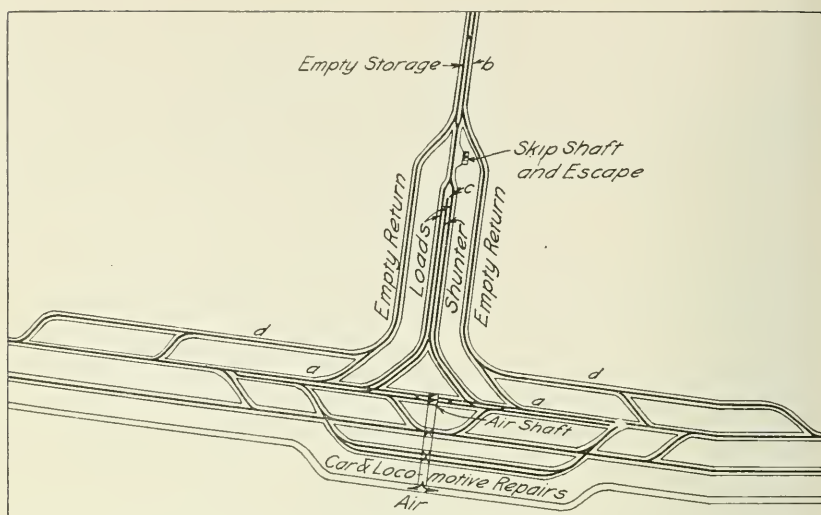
MAP OF SHAFT BOTTOM FOR SKIP HOISTING
